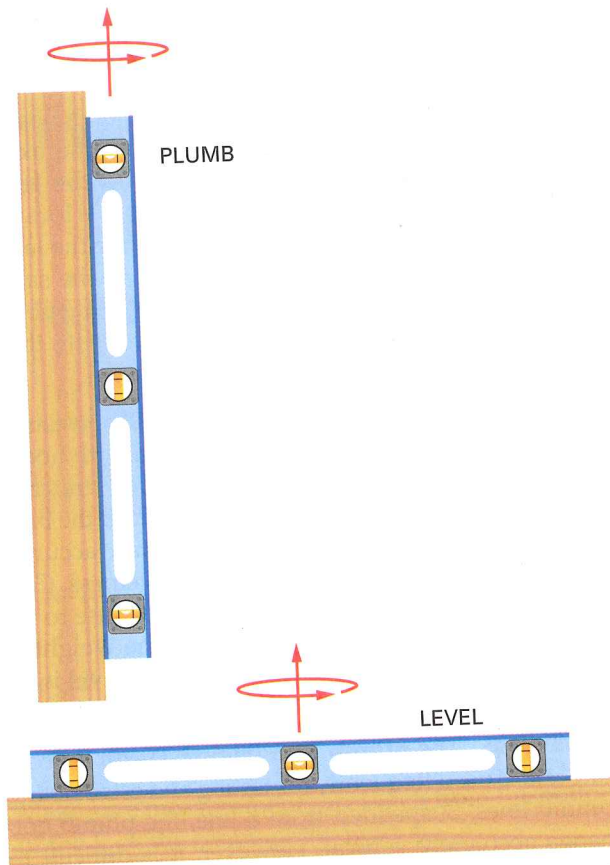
To check a level for accuracy the bubble should read exactly the same before and after rotating it.
